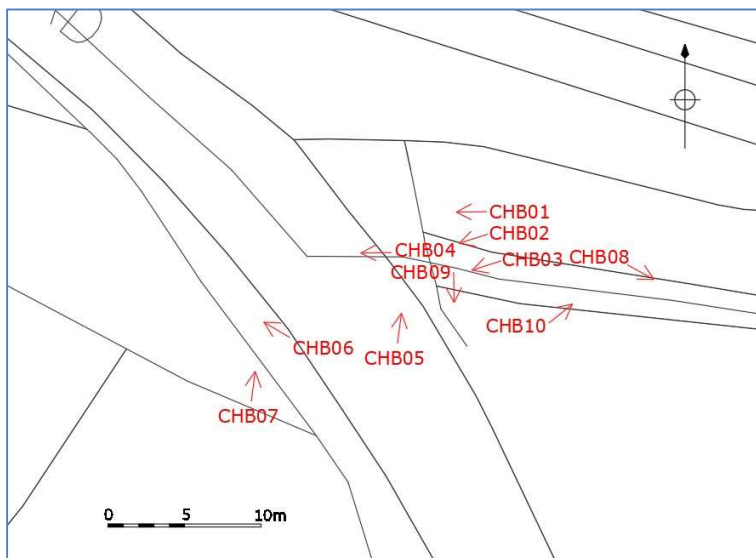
Photographic archive plan for Cocks Hill Bridge.
